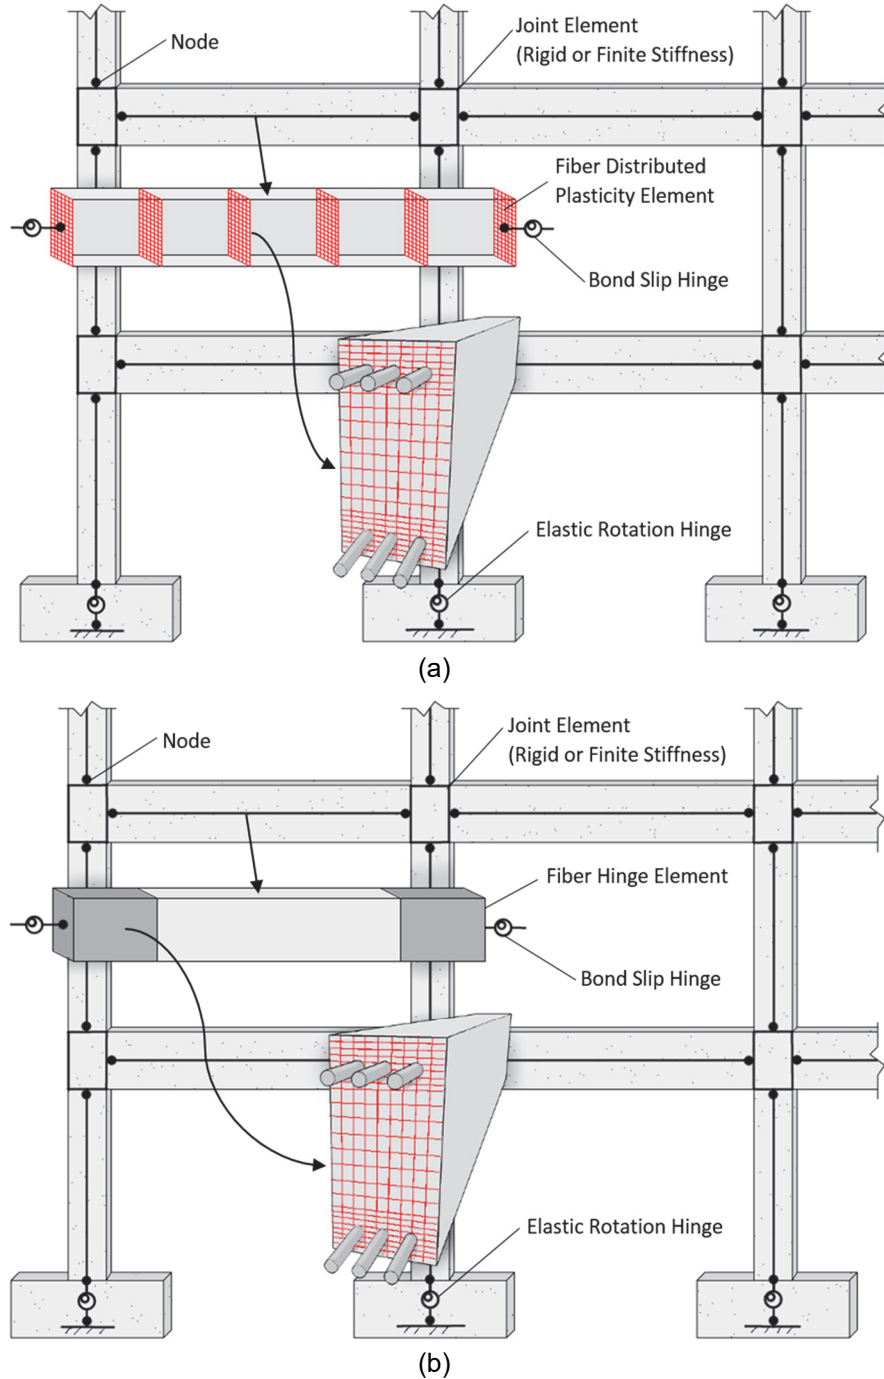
Overview of a typical reinforced-concrete moment-resisting frame system, showing the fiber-type model idealization.
